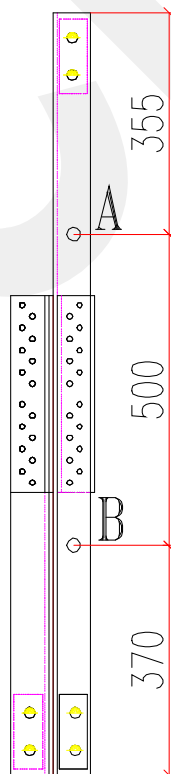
Displacement transducer location (dimensions in mm unit)
